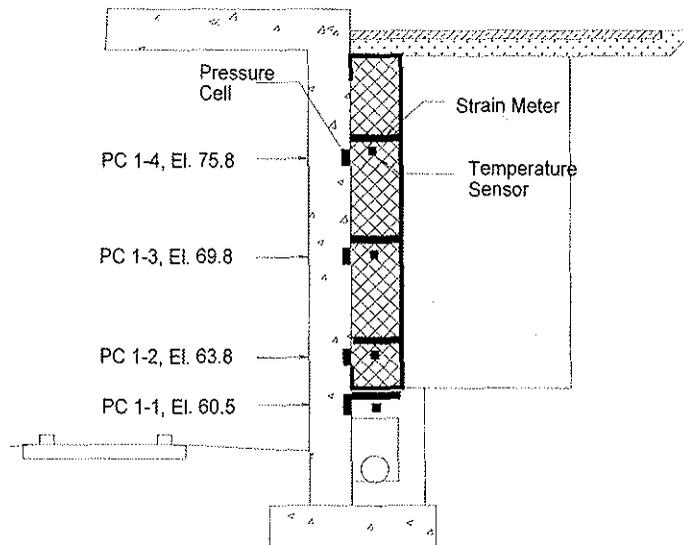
Cross section showing location of instrumentation at station 1004+50 (Humphrey, et al., 1998).
